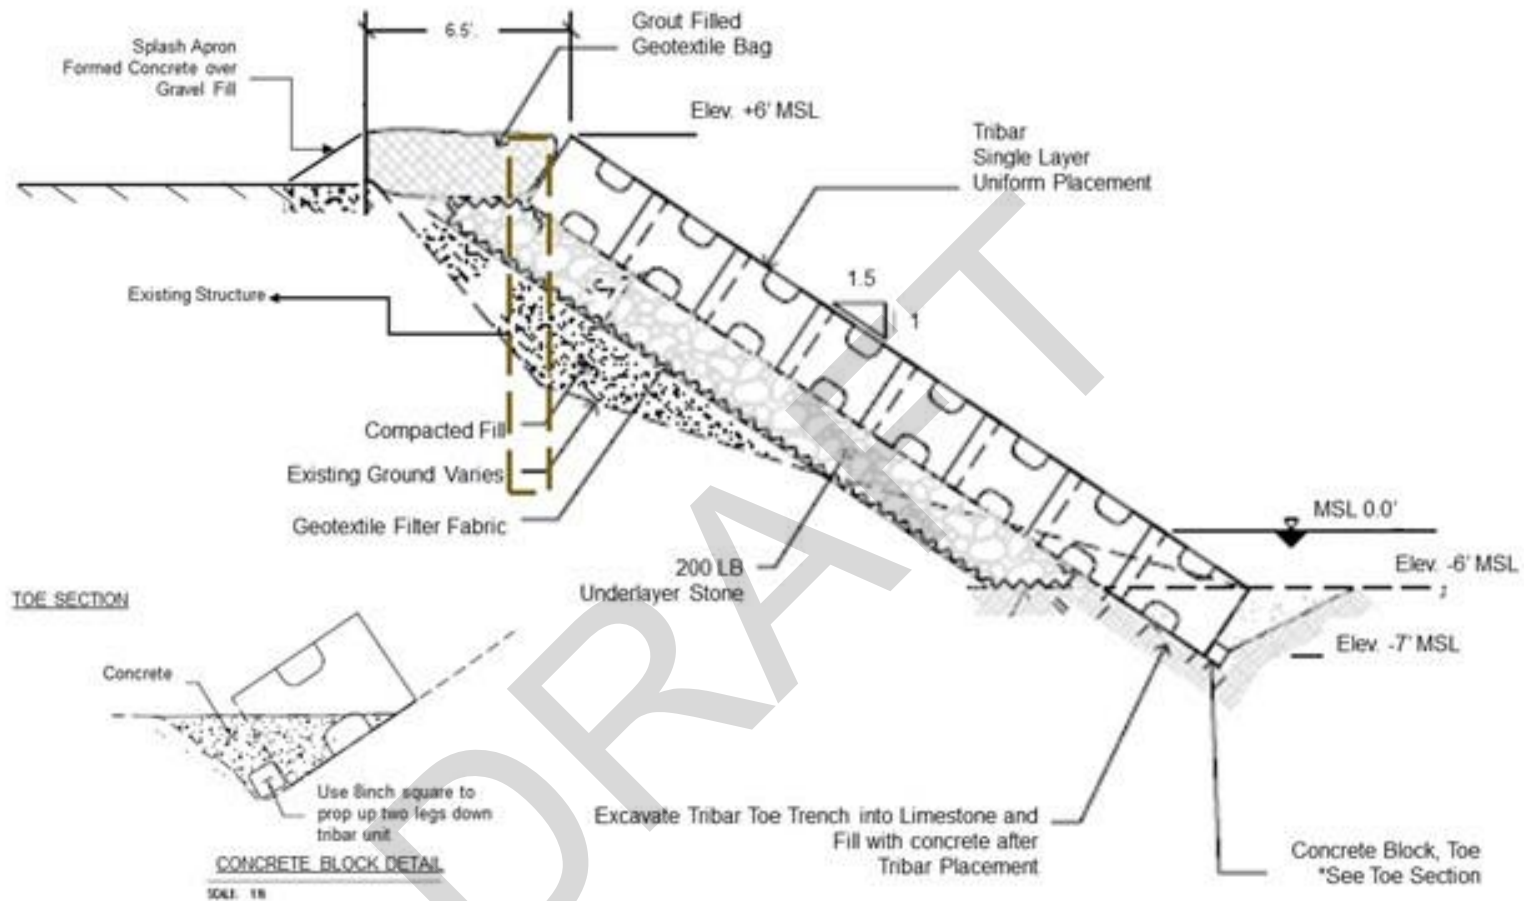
Concrete Armor Unit Revetment. Schematic of the proposed concrete armor unit revetment design (Alternative 2). Schematic provided by USACE.
